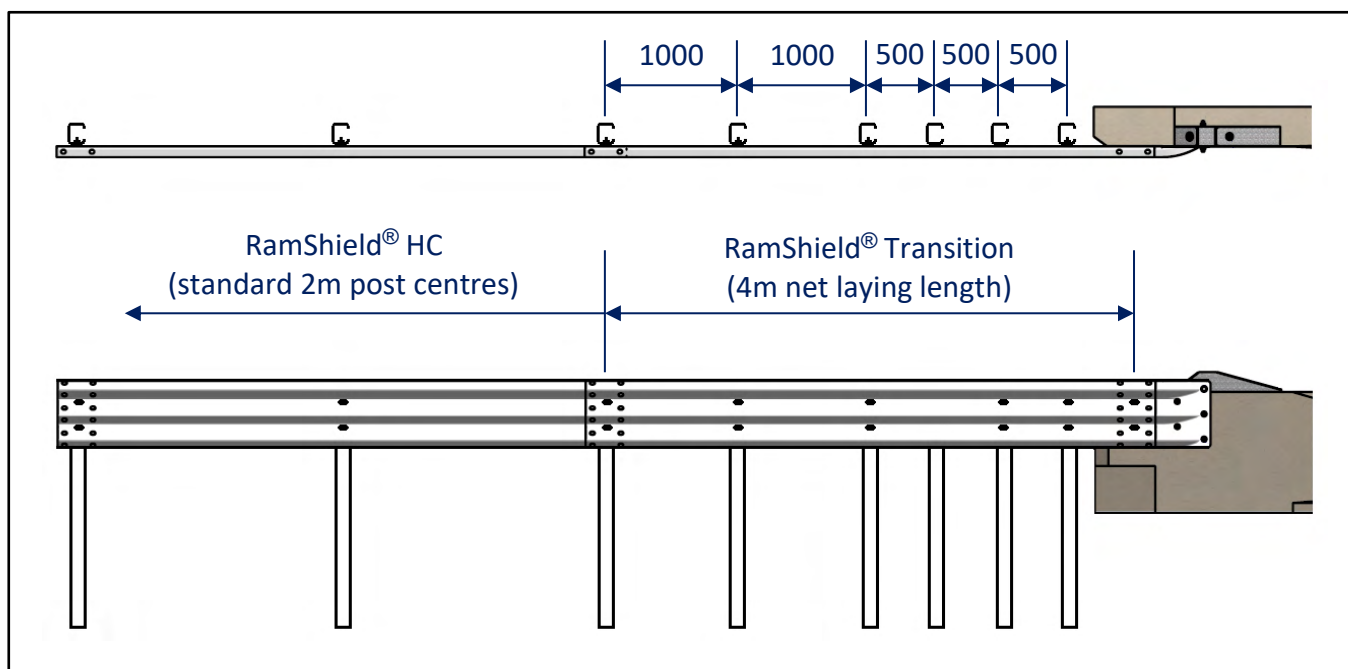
RamShield® HC Connection to a Concrete Abutment using the RamShield® Transition
